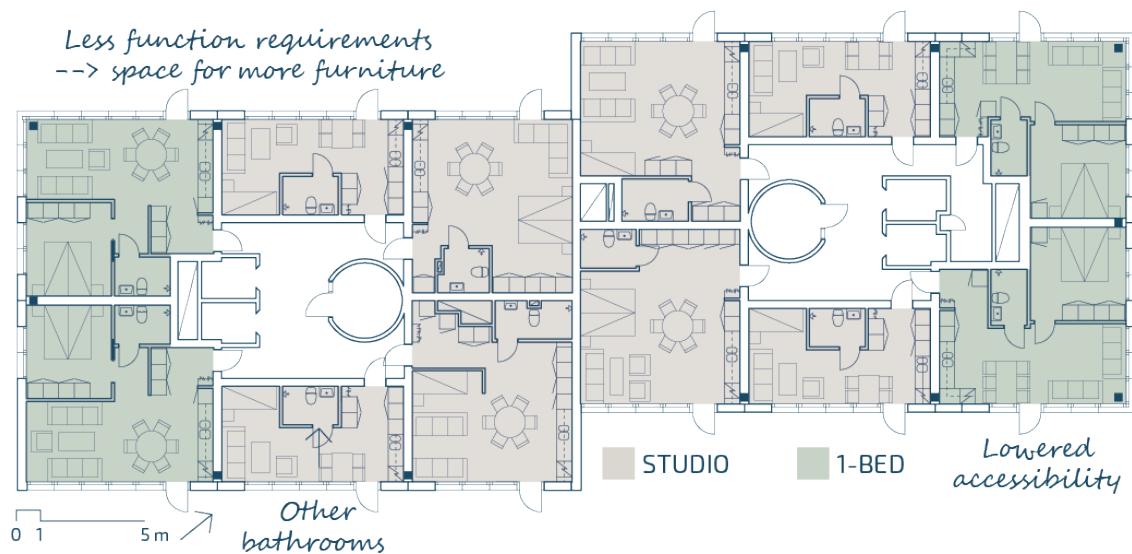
Floor plan for option Lowered standard - small, adapted from Eriksson (2024)
